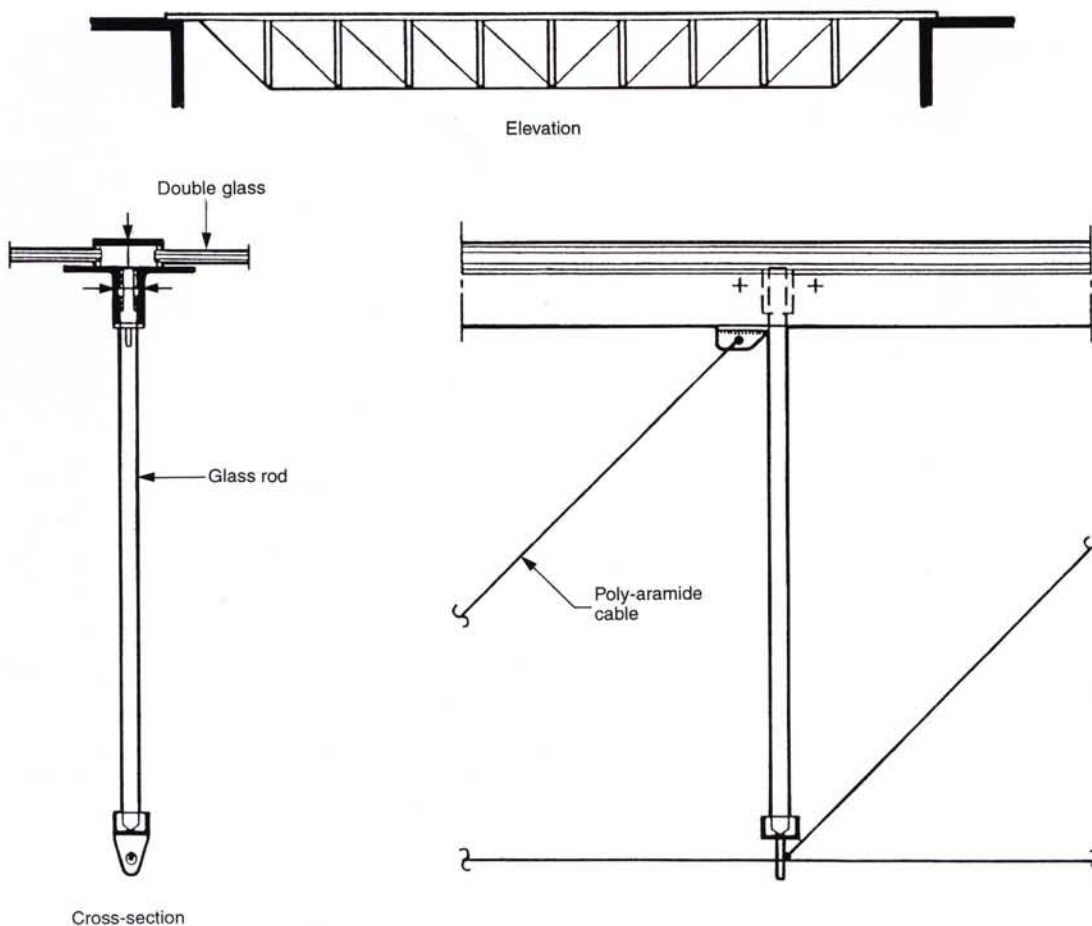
Glass rods as the web compression members in a truss (courtesy of Robert Nijssse, abt)
